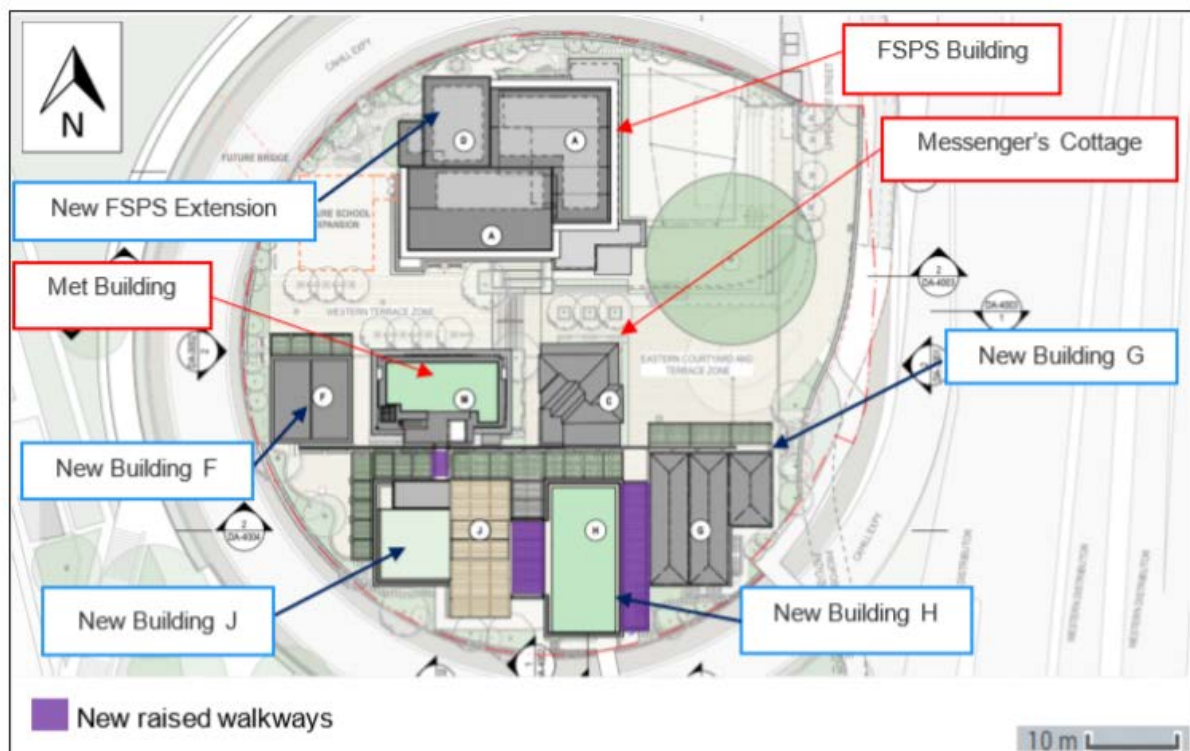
| Approved site plan (Source: Department's original assessment report, 2020)
